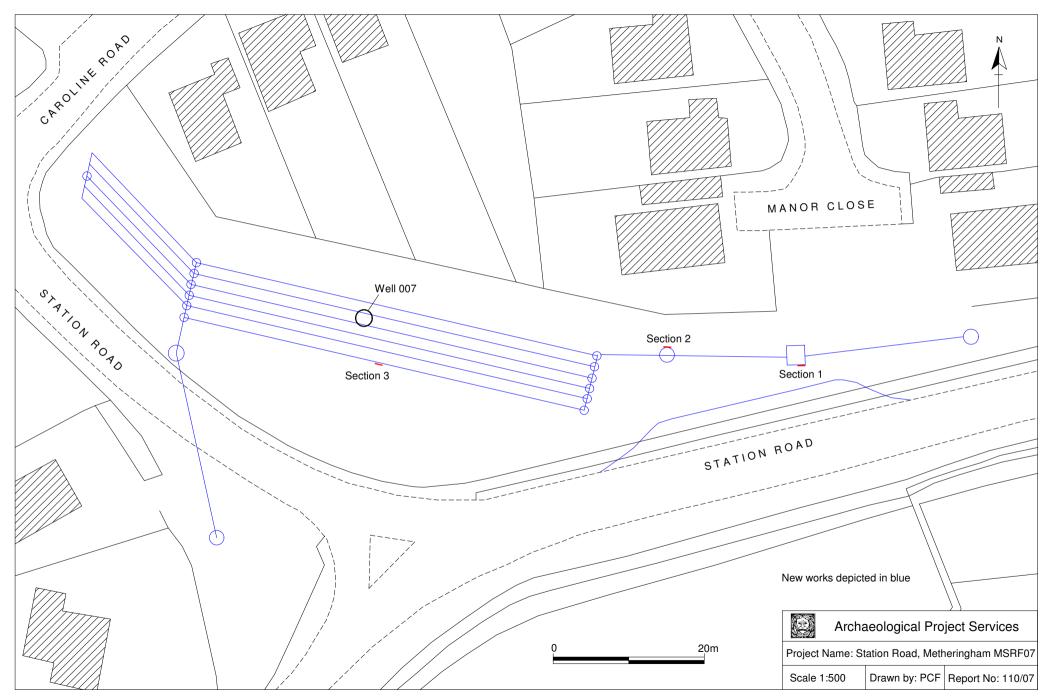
Plan showing the extent of groundworks and location of drawn sections
